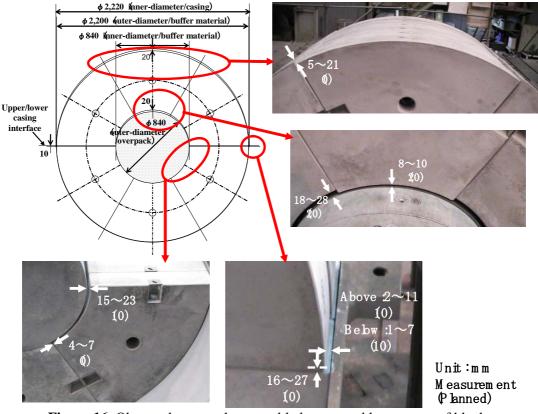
Observed gaps at the assembled upper and lower parts of blocks
